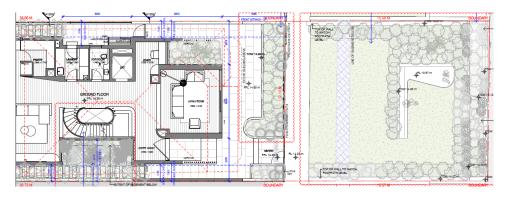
Proposed front terrace floor plan - 8 Victory Street, Clovelly (Source: BJB Architects Pty Ltd)
